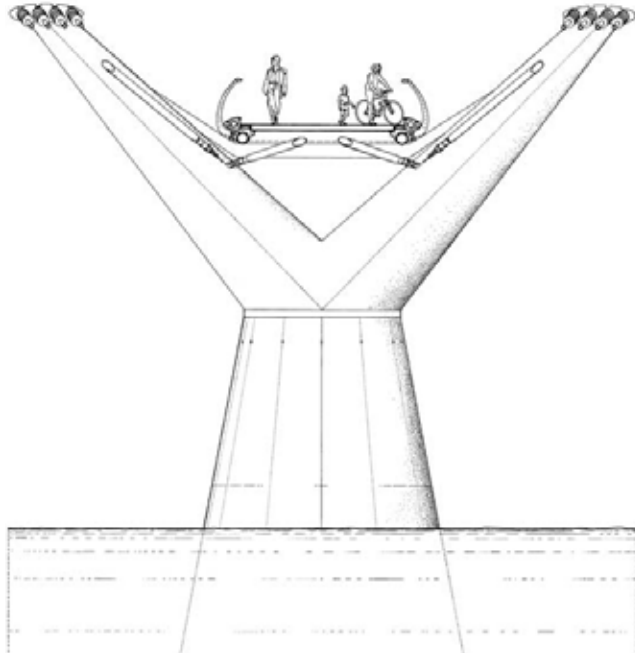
Foster + Partners' drawing of the Millennium Bridge, London adjacent to an in-situ concrete pier
